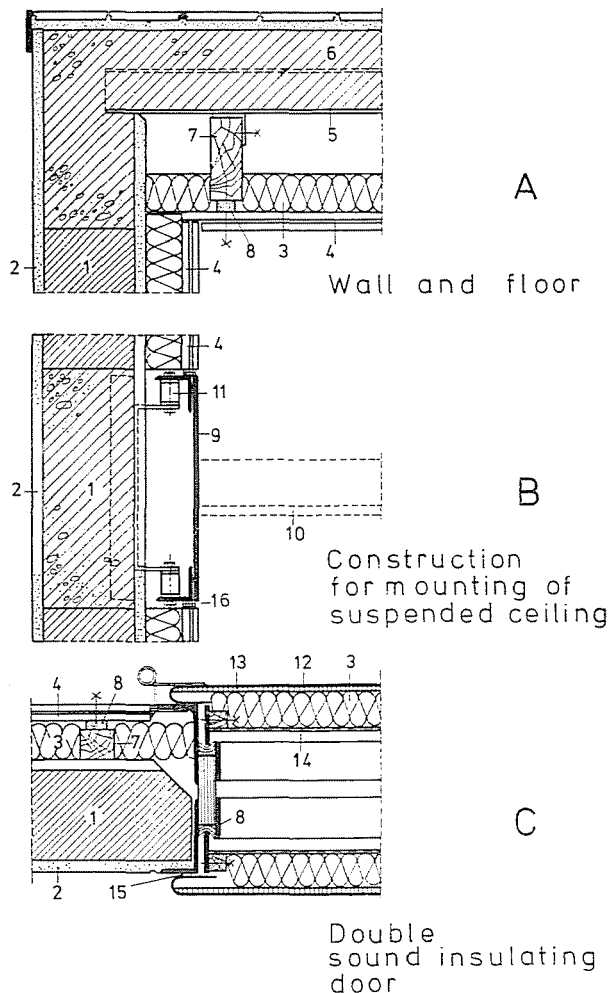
Details of construction. 1 — Solid brick wall; 2 — plaster; 3 — slag wool; 4 — $2 \times 9,5$ mm gypsum plaster board; 5 — corrugated steel plate; 6 — concrete; 7 — timber beam; 8 — rubber; 9 — steel plate cornice; 10 — suspended ceiling under test; 11 — rubber spring; 12 — steel plate 2 mm thick; 13 — vibration damping material; 14 — perforated plate; 15 — felt; 16 — plastic joint
